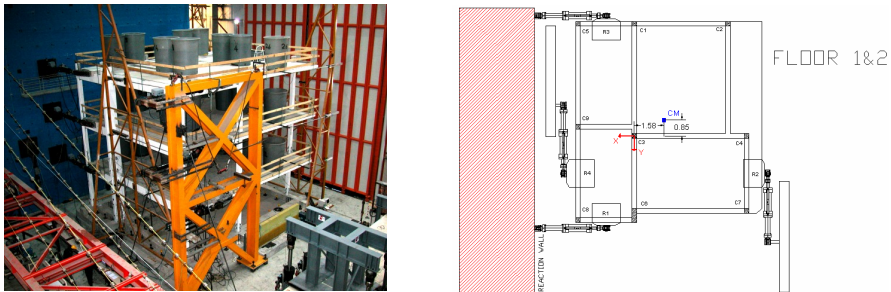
3D tests on an full-scale model of a torsionally unbalanced RC structure: view of the model at the testing site (left); actuators layout and location of floor centre of mass (CM) (right).
